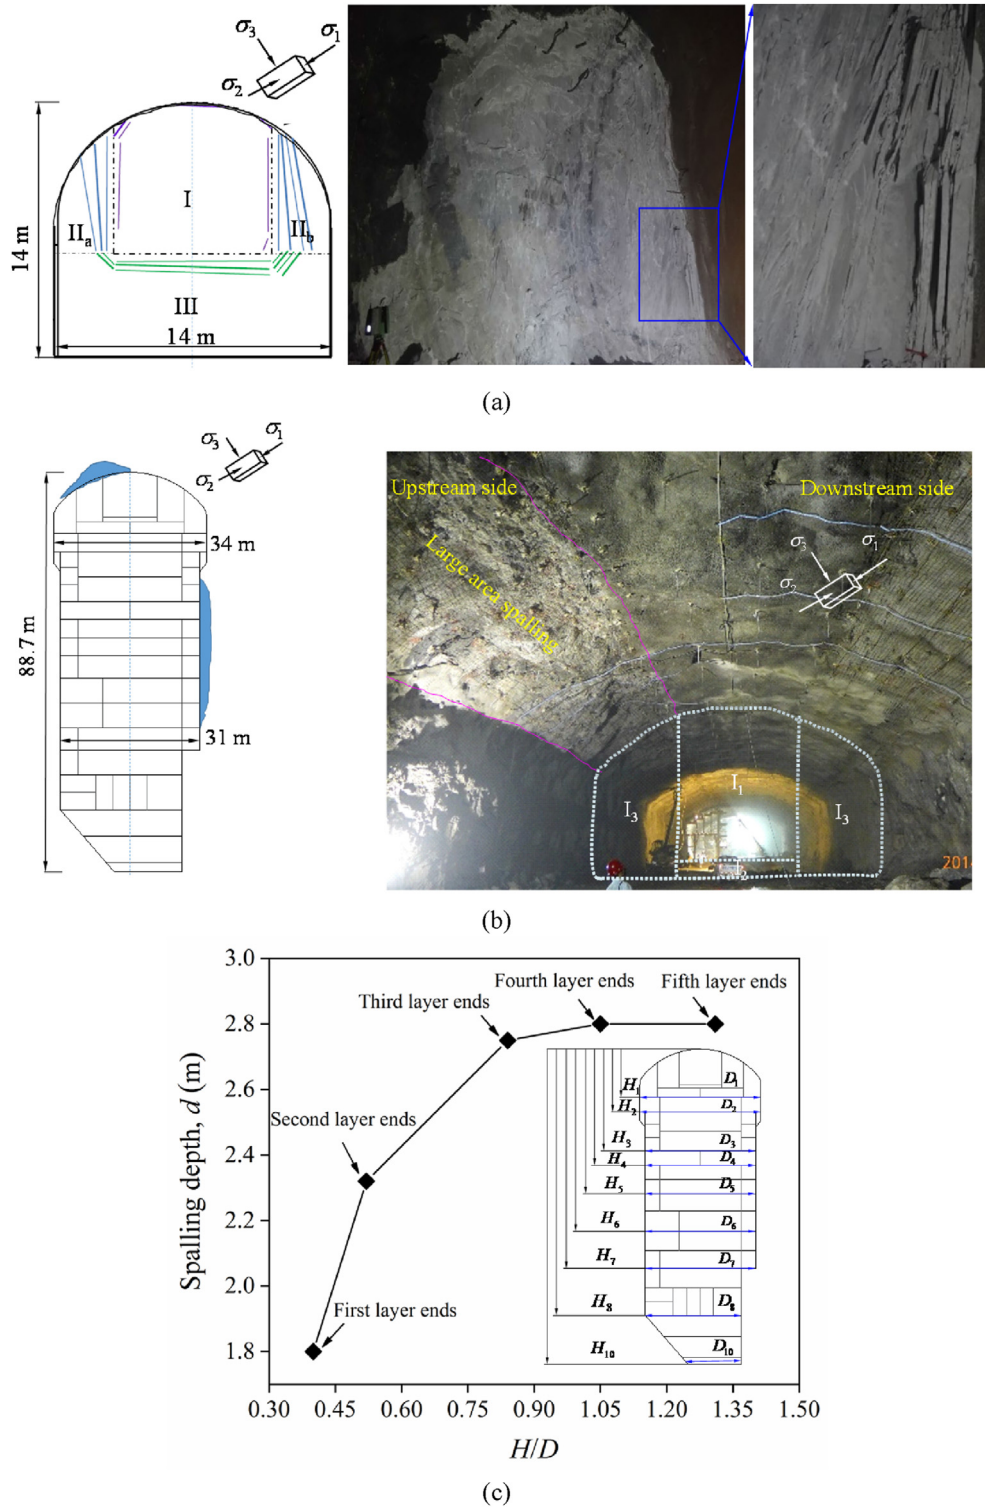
Typical engineering excavation structures, failure mechanism and modes and site photos of rock spalling during (a) the pilot tunnel excavation of tunnel No. 7 of CJPL-II (after Feng et al., 2018a), (b) the first layer excavation of the underground powerhouse on the left bank of the Baihetan hydropower station (after Liu et al., 2017), and (c) the results of spalling evolution under layered and divisional excavation of a large underground powerhouse.
